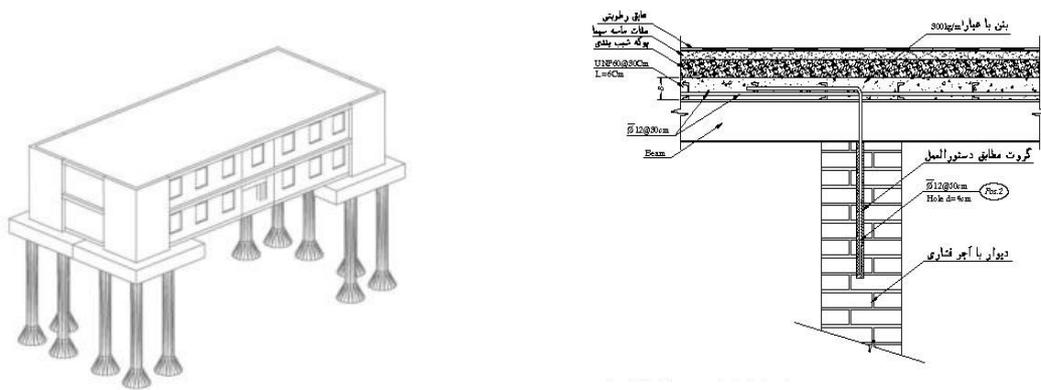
Schematic overview and detail of retrofitting by shear wall pattern
